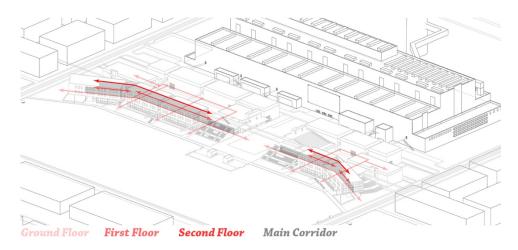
Building Proposal – Interior Circulation (Source: Author)
